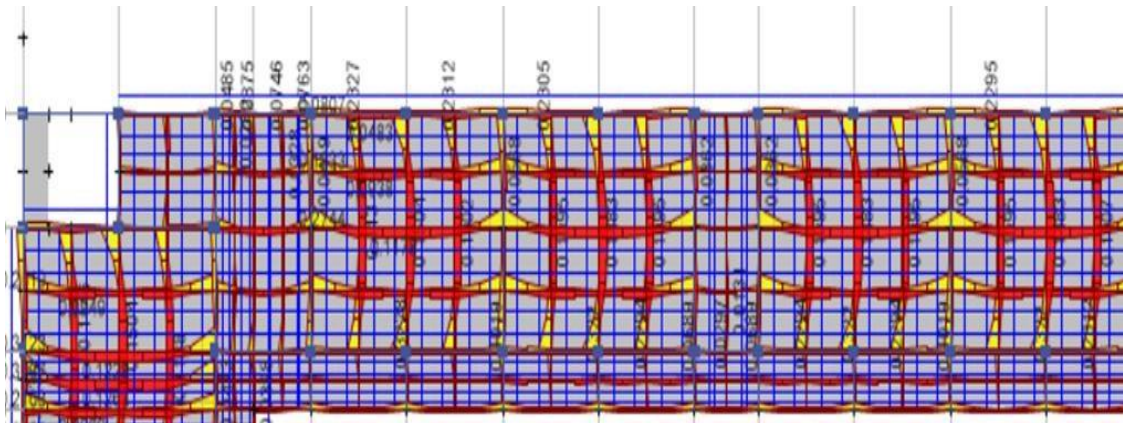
3 Slab Top and Bottom Reinforcement Layout
